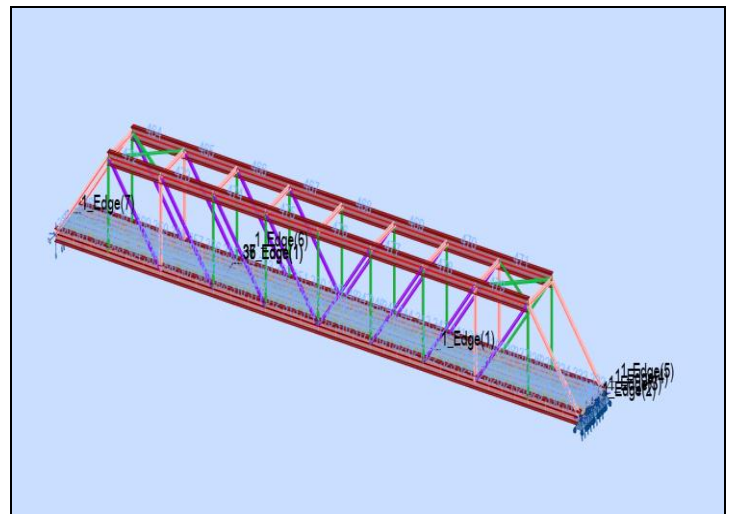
(3D View) 3D view of Pratt Truss bridge model.
